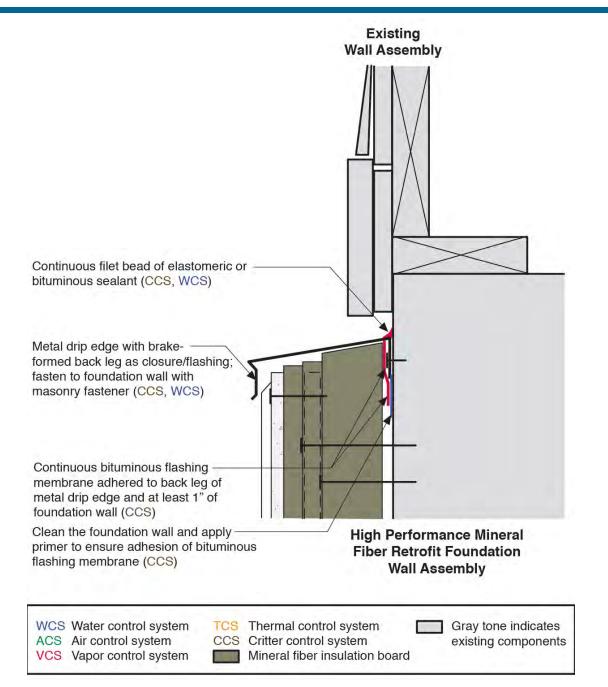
Schematic detail for transition from a non-retrofit wall assembly to a top of high performance mineral fiber retrofit foundation wall assembly showing how the metal closure/transition flashing is secured and sealed to the foundation wall.
